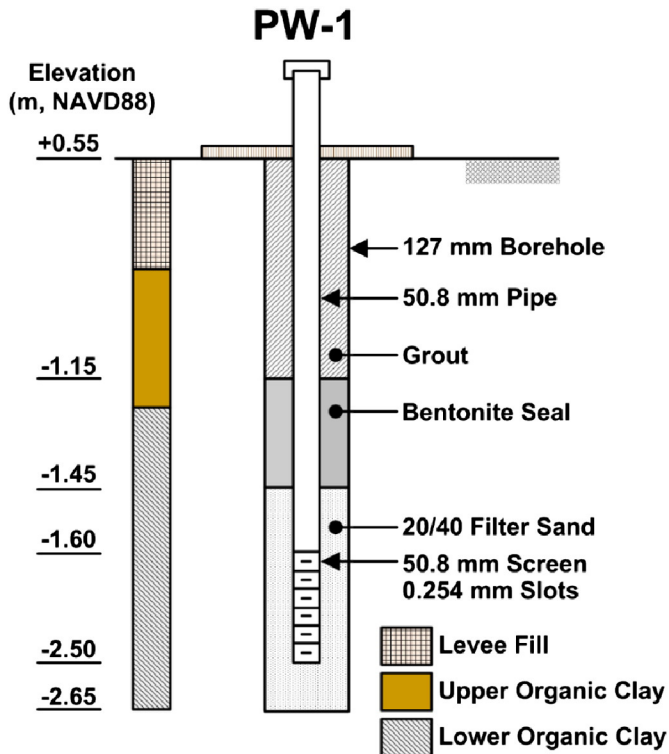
Cross-section and soil profile at PW-1 for Site 1 Pump Test (elevation not to scale).
